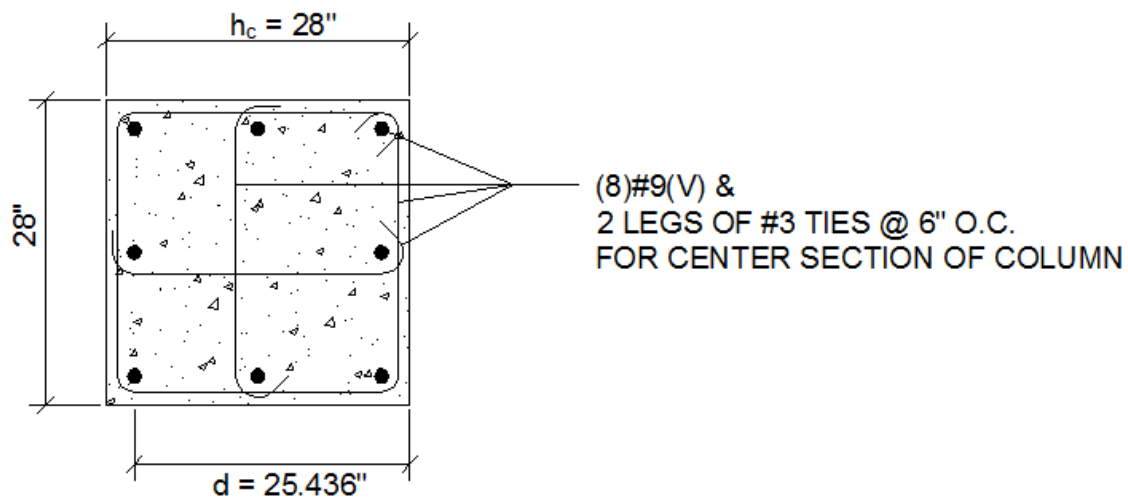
Exterior column, cross-section at center of column at 2nd – 6th floor levels based on SDC D design.
